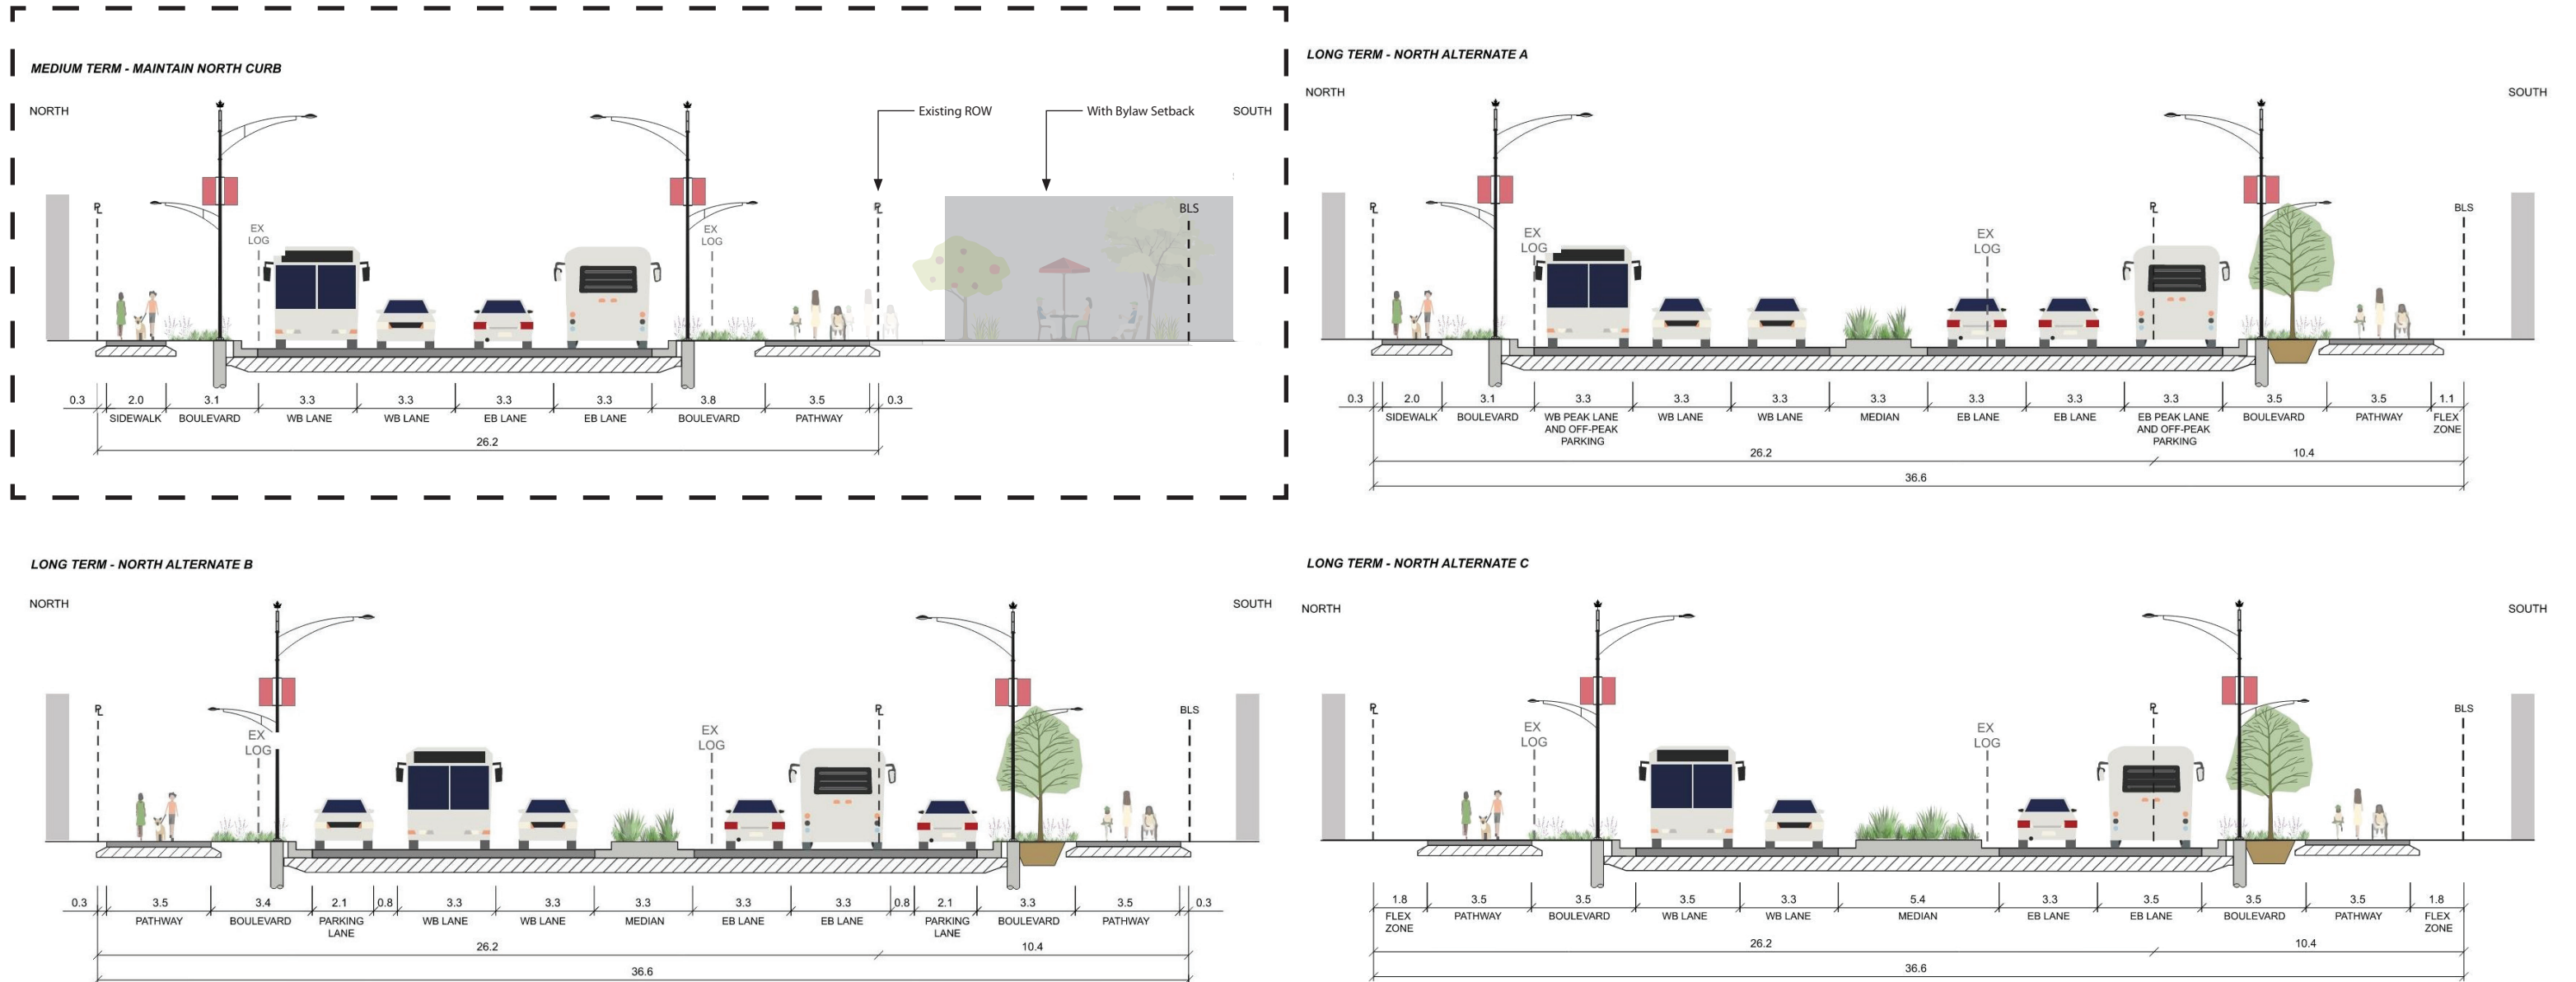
FLEXIBLE CROSS SECTIONS (MAINTAINING NORTH CURB LINE)
